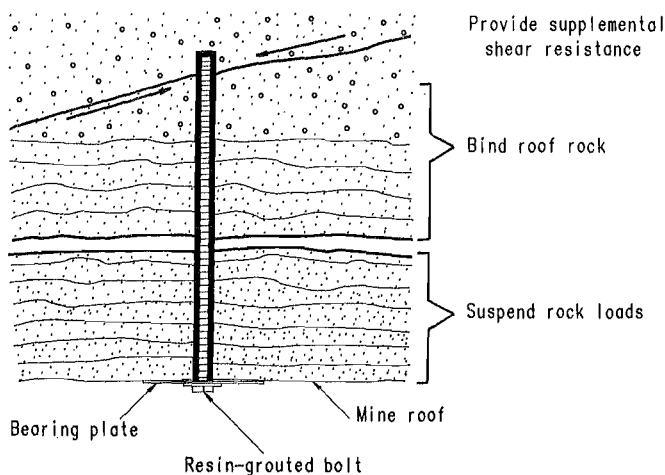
Resin-grouted bolt reinforcement mechanisms.
